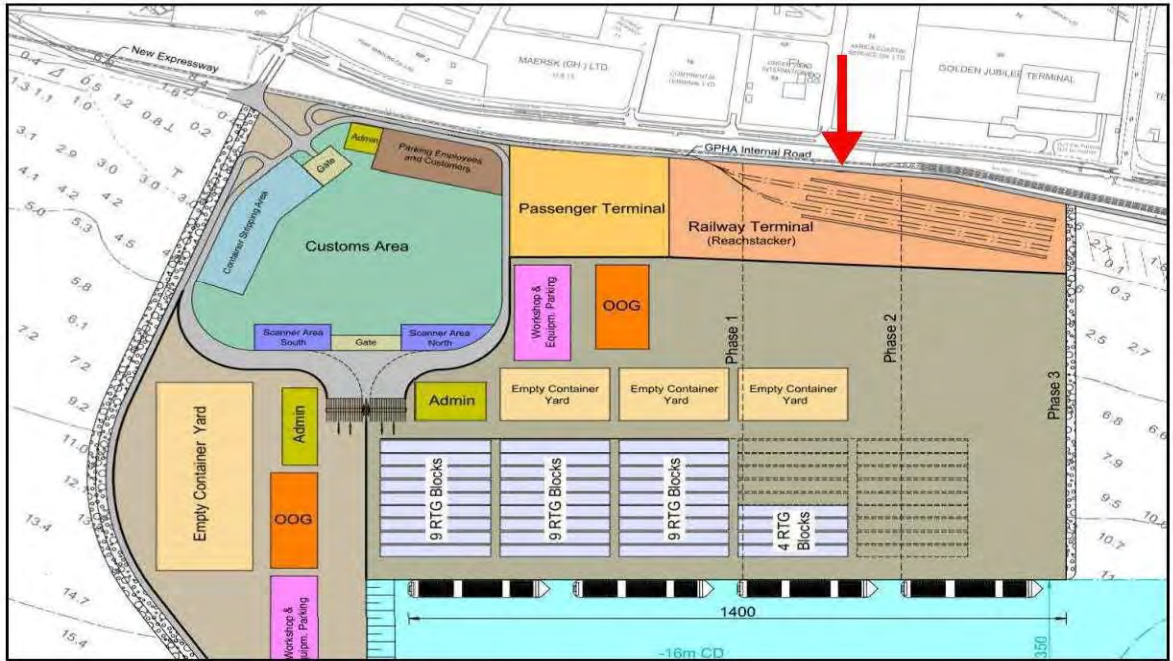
Corridor for Potential Off-Dock Railway Terminal
